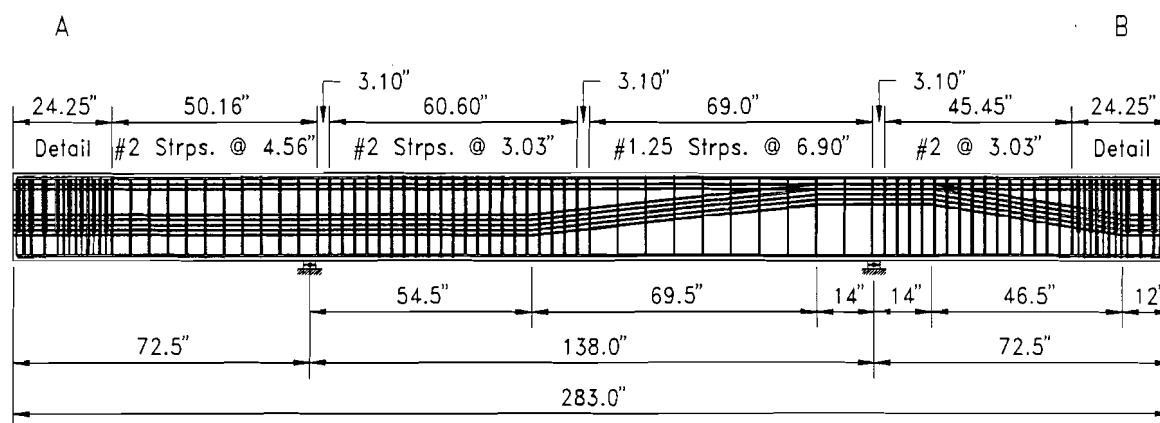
Beam 2A dimensions, stirrup locations, and tendon drape points.
